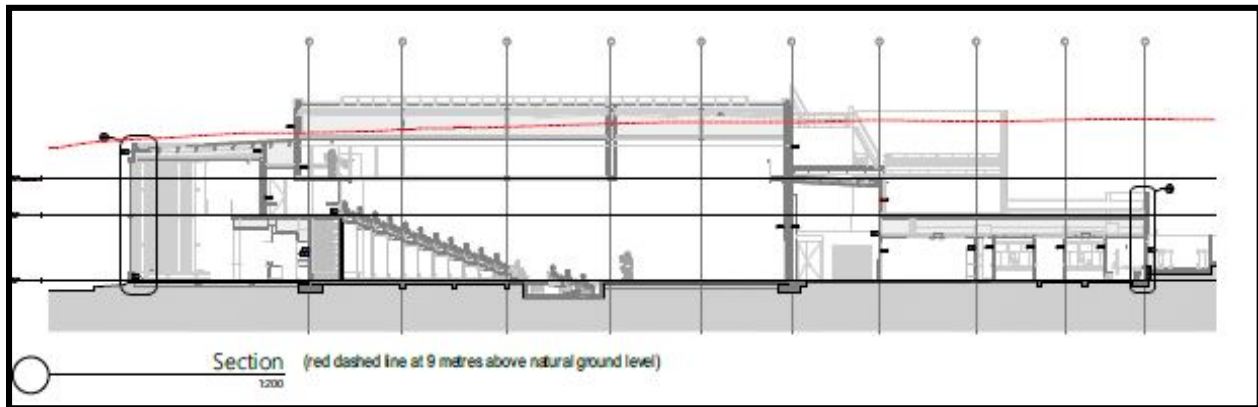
Section Detailing Height Breach (Source: William Ross Architects)
